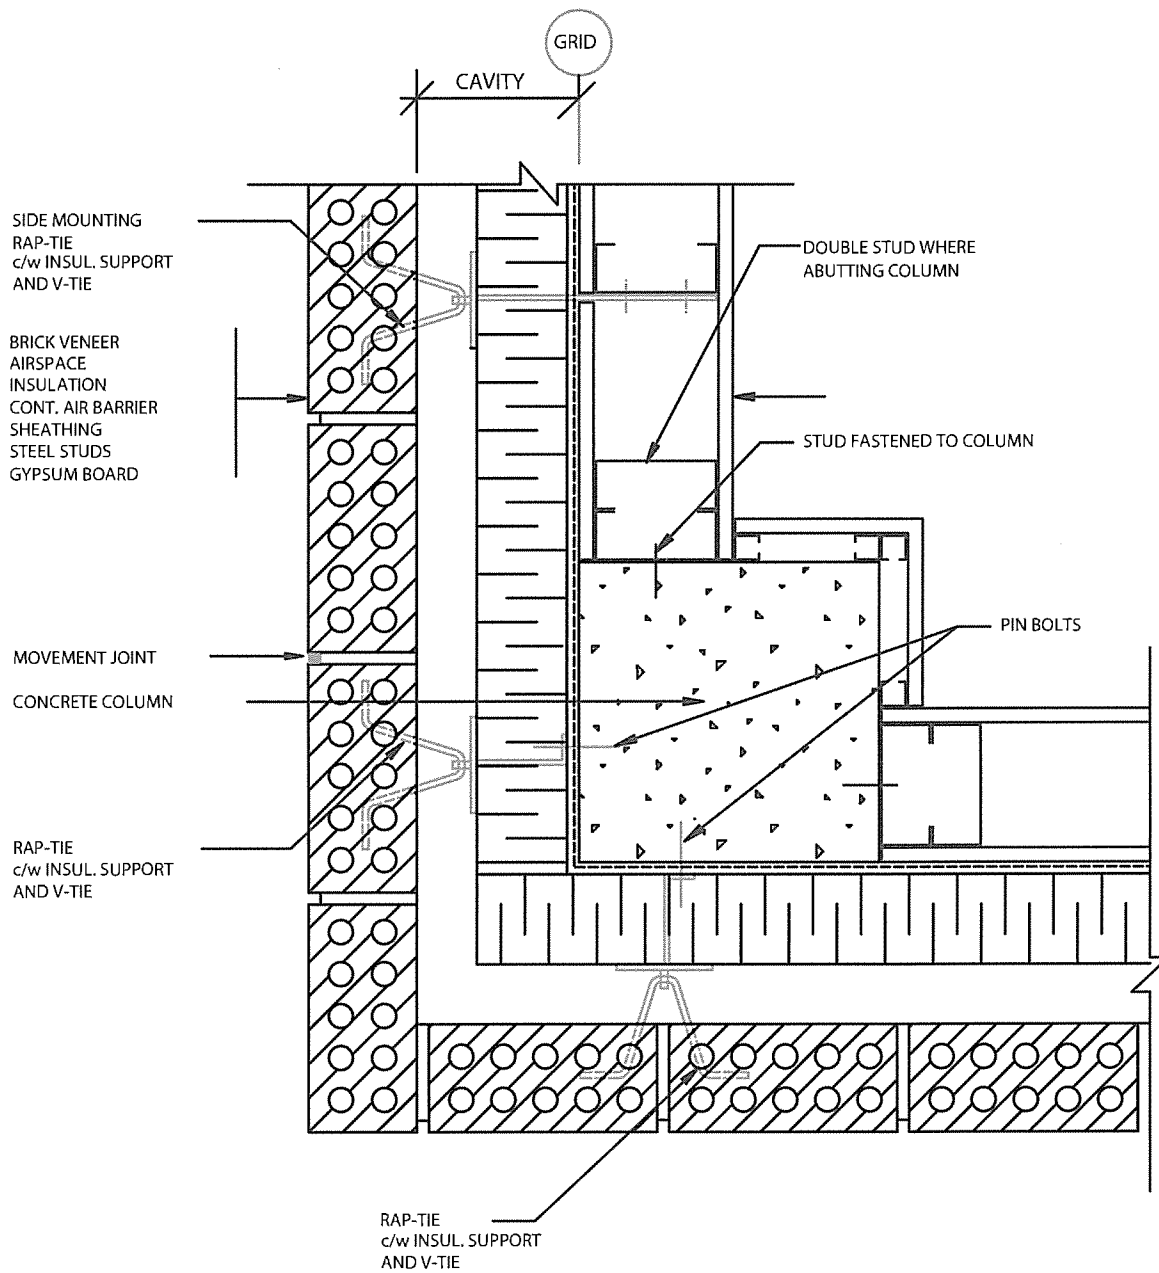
BRICK VENEER / STEEL STUD - CONTROL JOINT/AIR STOP
